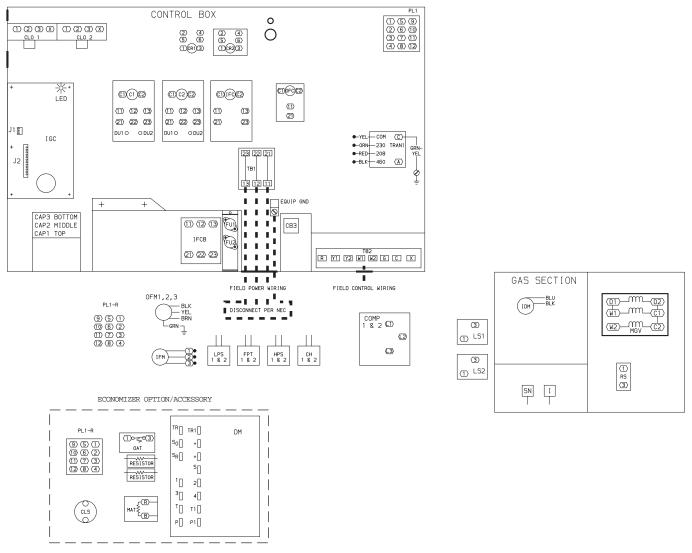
Typical Component Arrangement (581A180 Shown)
